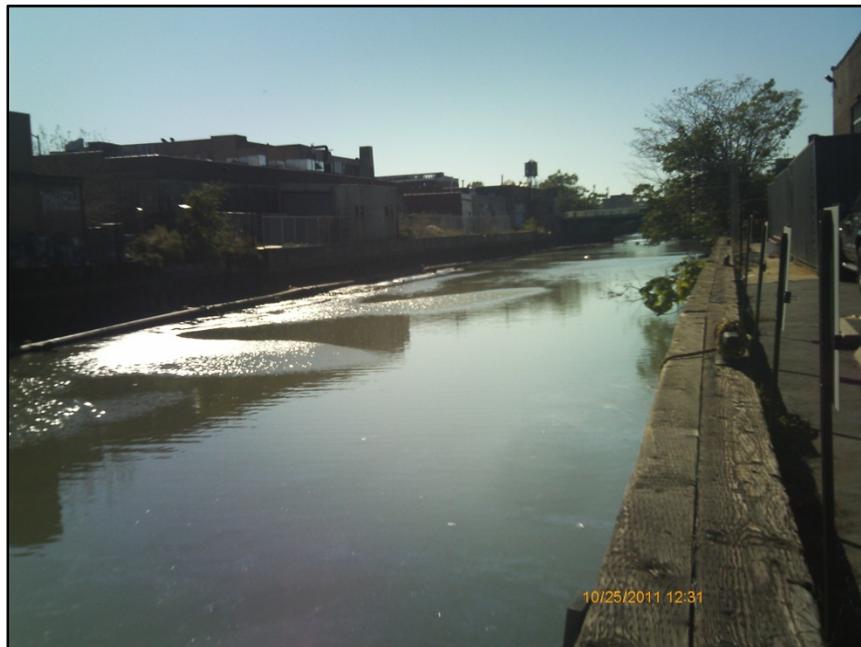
Looking north from the Union Street Bridge toward the head end of the Gowanus Canal at the proposed dredging location. Taken at ebb tide.
